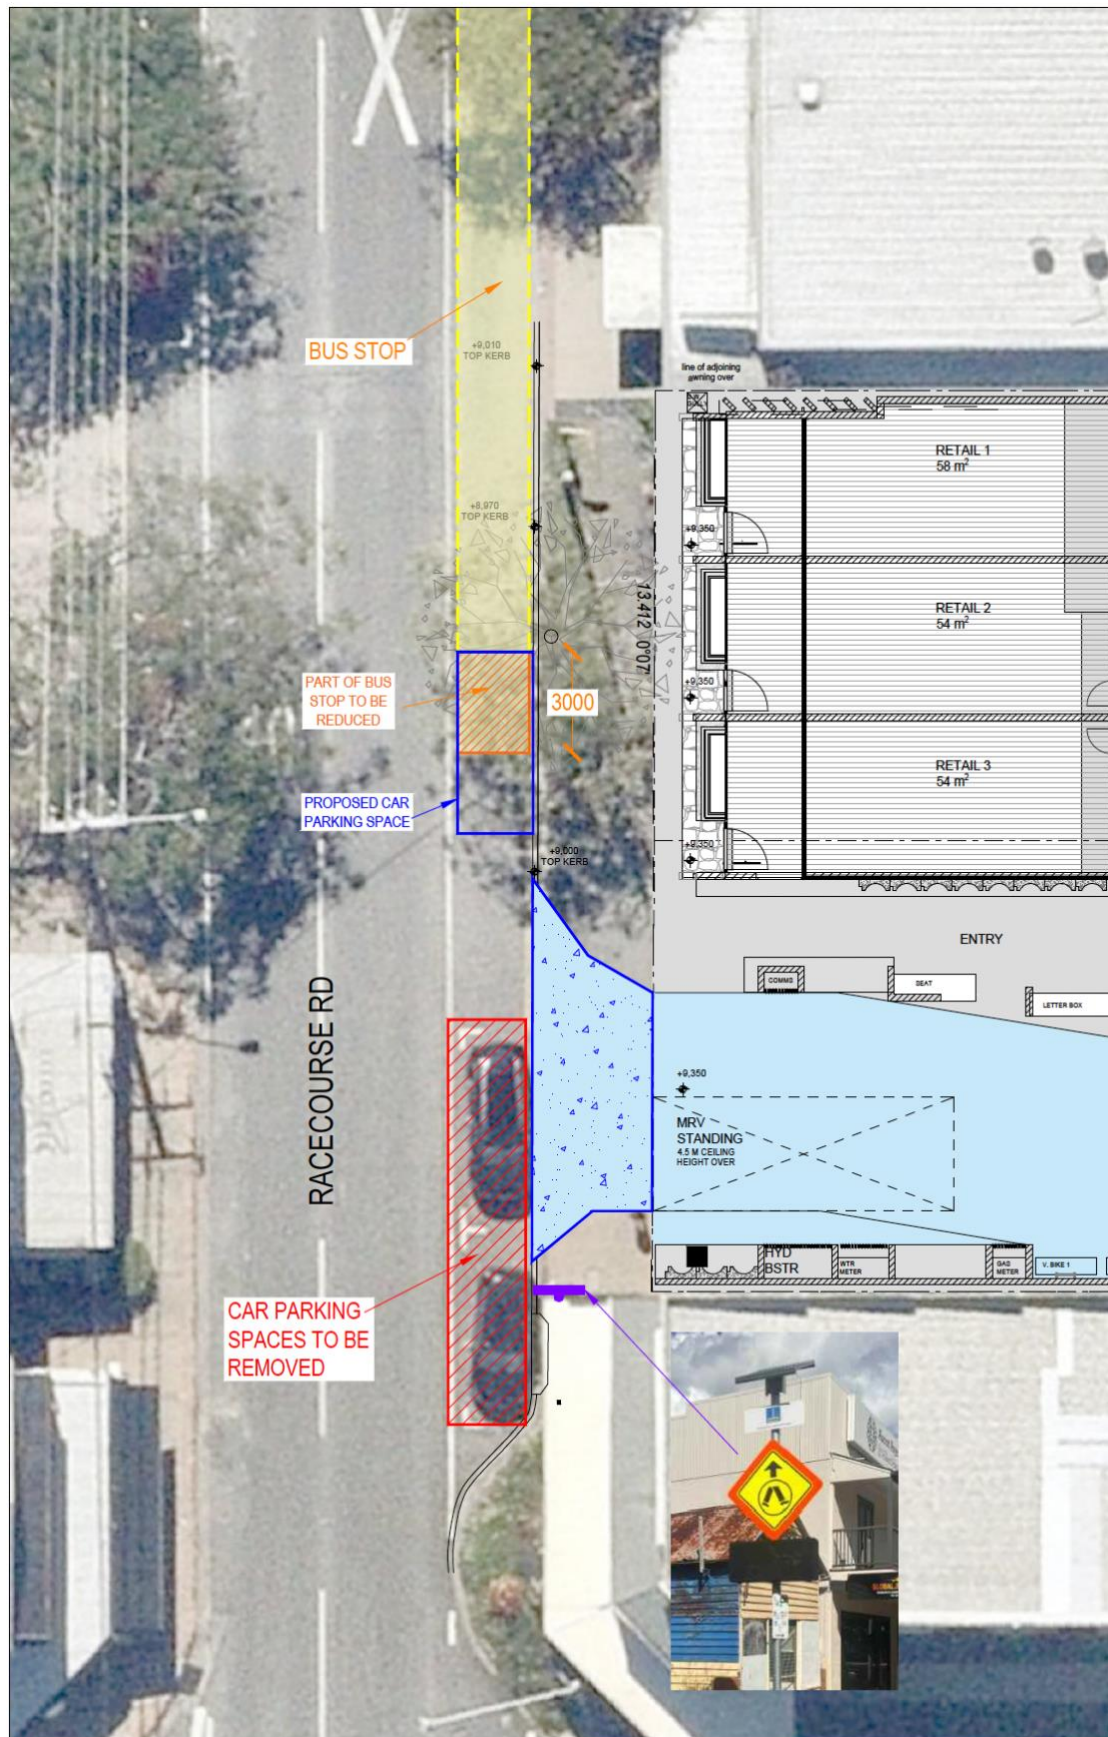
PROPOSED LINE MARKING AND SIGNAGE PLAN
